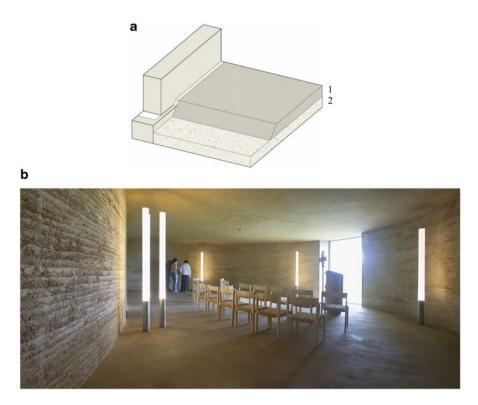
Rammed earth floor (a) basic structure [52]. (*1*) Rammed earth applied in layers (6–7 cm) ca. 15–20 cm. (2) Gravel–sand capillary break layer ca. 15–20 cm. (b) Chapel in the Central Hospital in Suhl/Germany [55]
